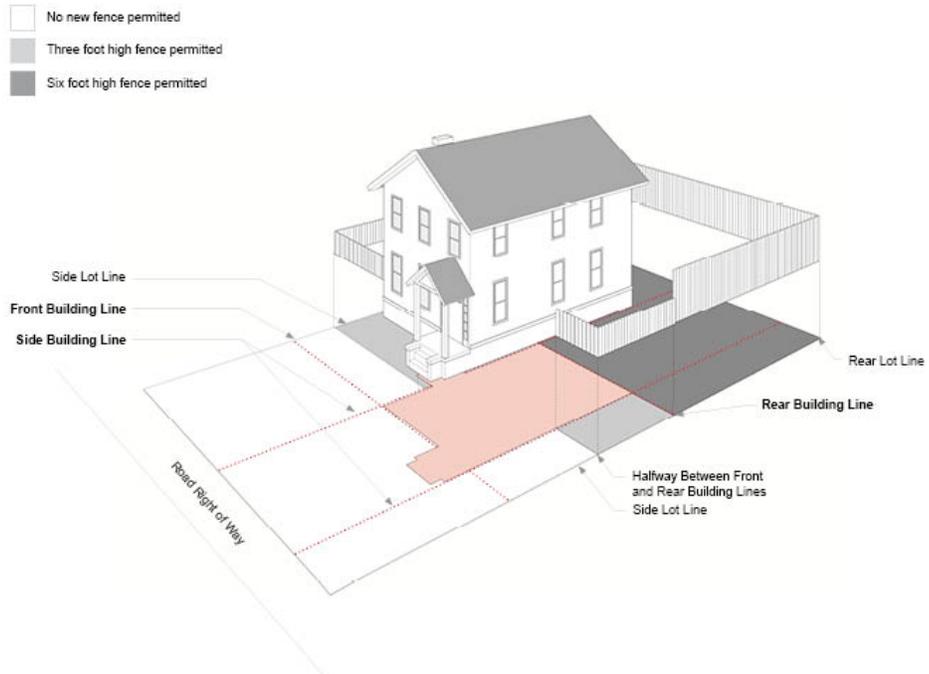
a: House on Interior Lot- Fence Behind Half-Way Point of Front and Rear Building Lines Option B
